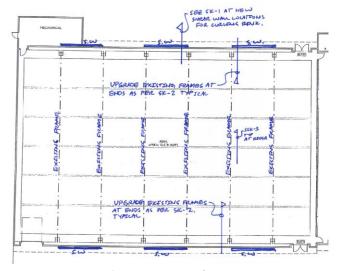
Excerpt from RJC Structural Assessment Report Plan view showing areas to be modified.
